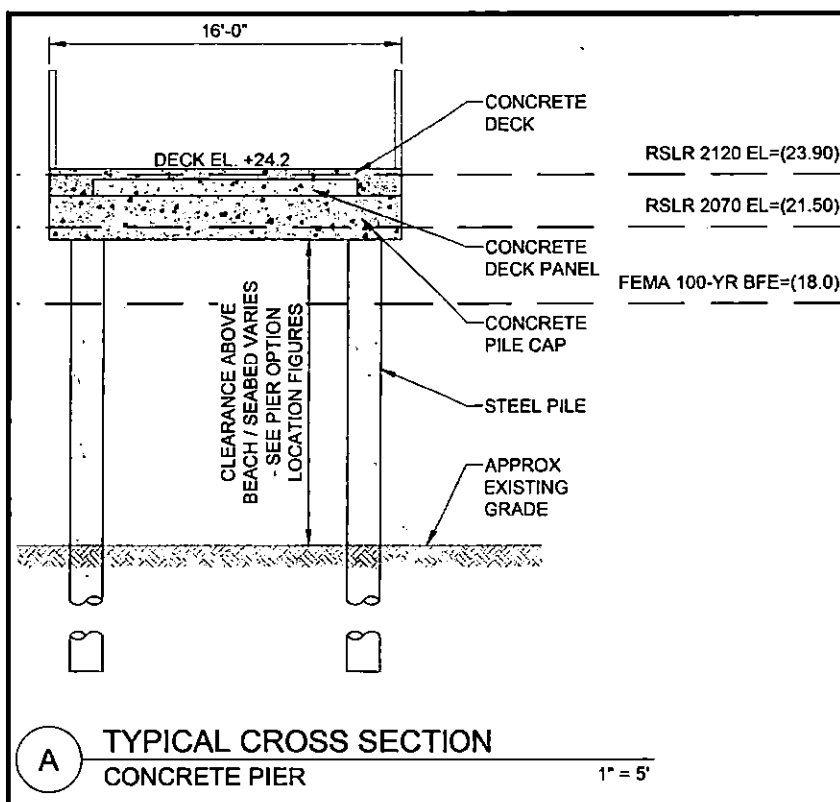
Proposed Precast Concrete Pier Conceptual Cross Section
